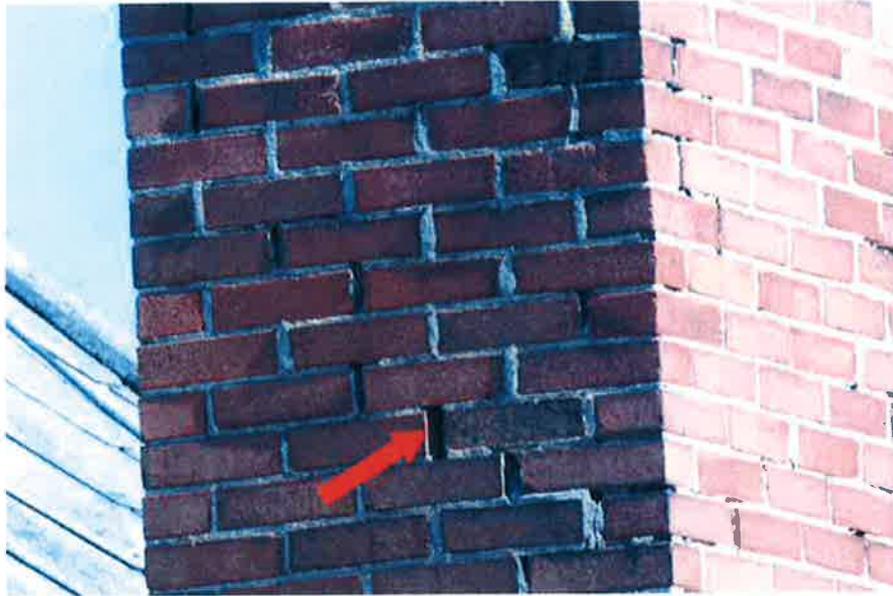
Brick masonry mortar joints in the chimney on the east elevation of the building exhibited cracking.
